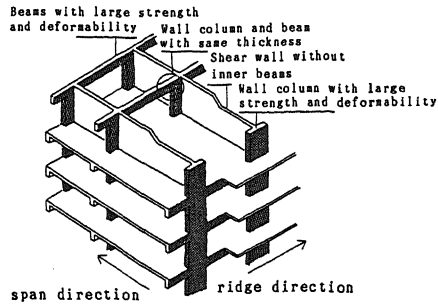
Outline of Structural System of the R/C Frame Structure with Wall Column
